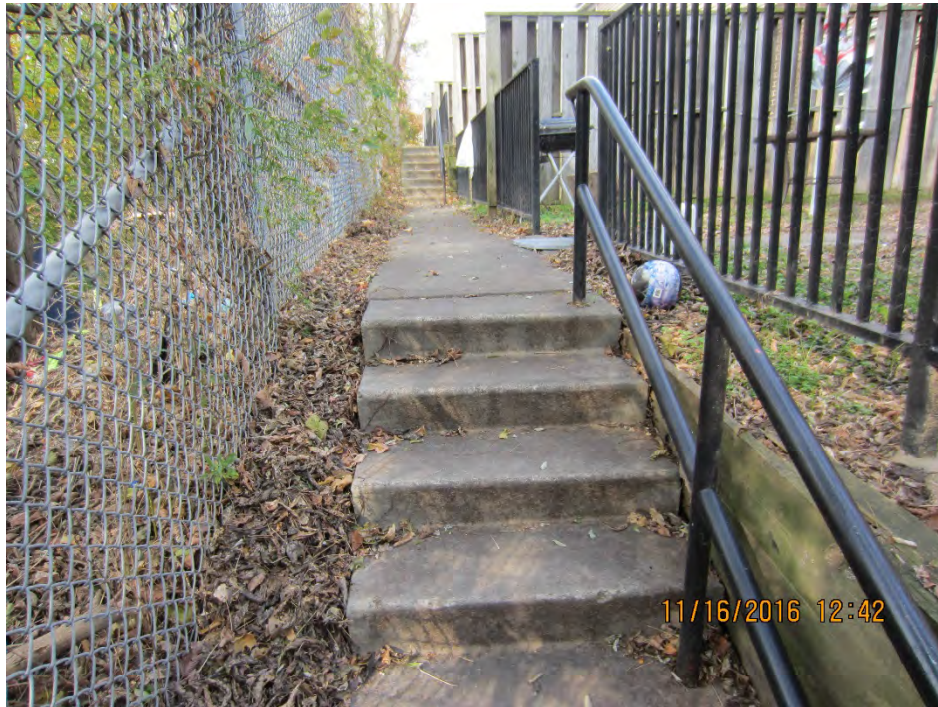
Grind & caulk top step [Plan Sheet SP-2]
